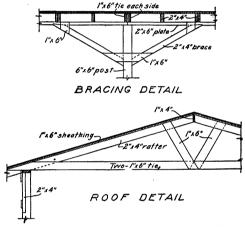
Bracing and roof detail of open shed (design no. 2198).
